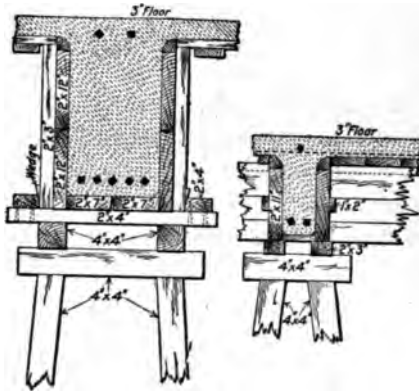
Girder Form, United Shoe Machinery Co.'s Factory, Beverly, Mass.
